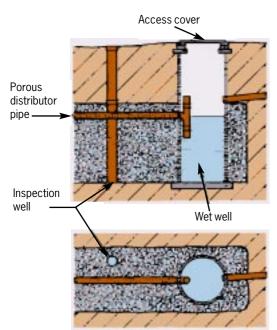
Trench-type soakaway with large wet well equipped with T-piece overflow to porous distributor pipe and separate inspection well
